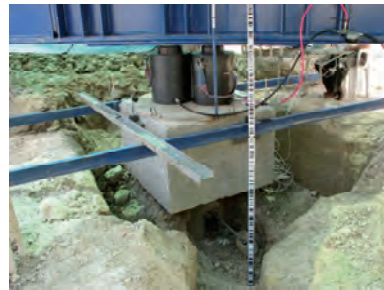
Concrete cap at the pile top with loading jacks and measurement devices
